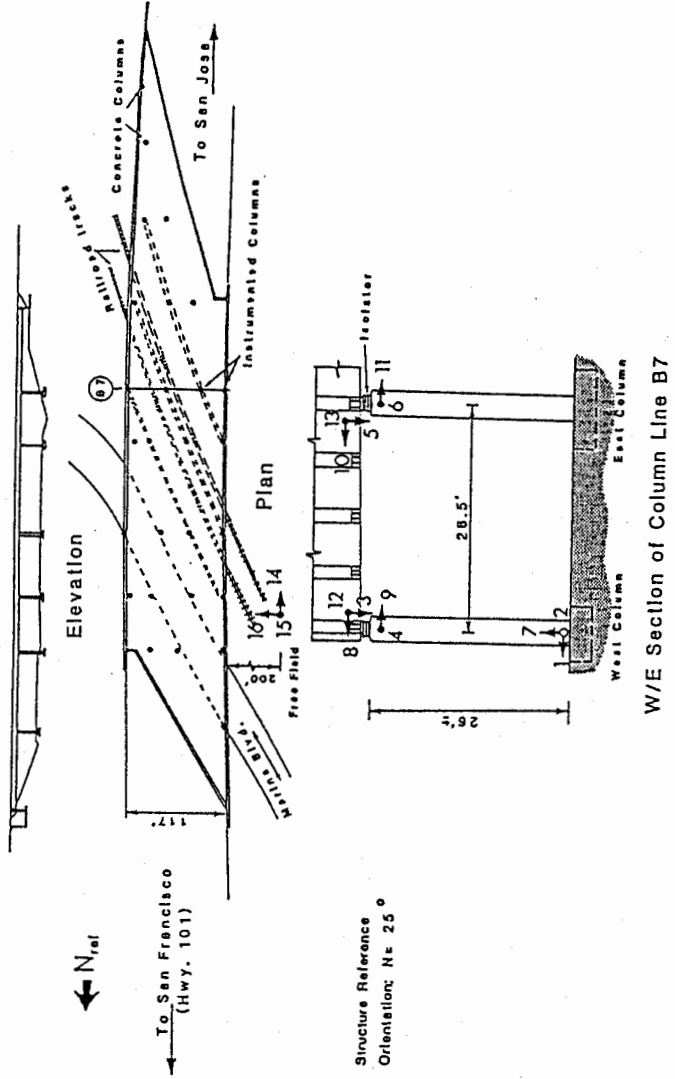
Sierra Pt Overhead Plan and Elevation with Instrumentation Layout
